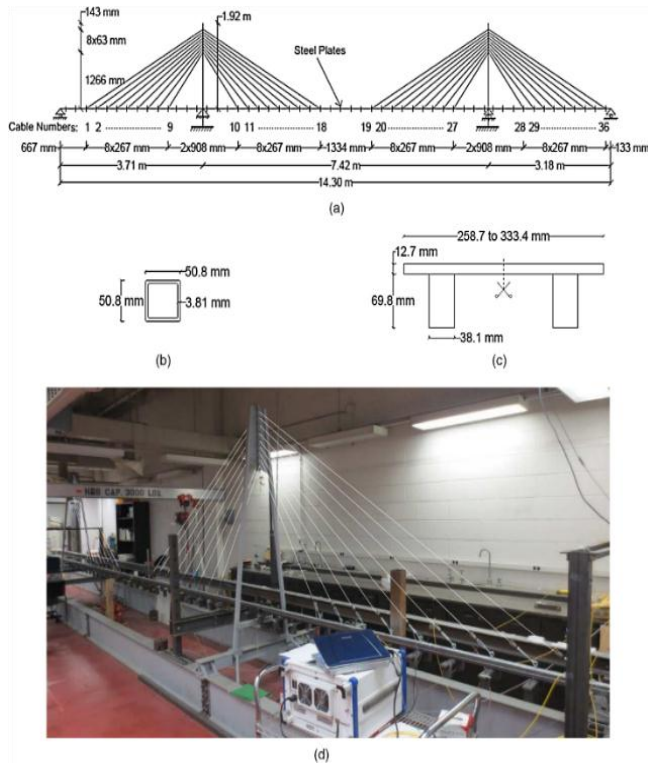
Structural model: (a) side view; (b) cross-sectional view; (c) steel plates to consider the dead load; (d) photo of the model bridge.
